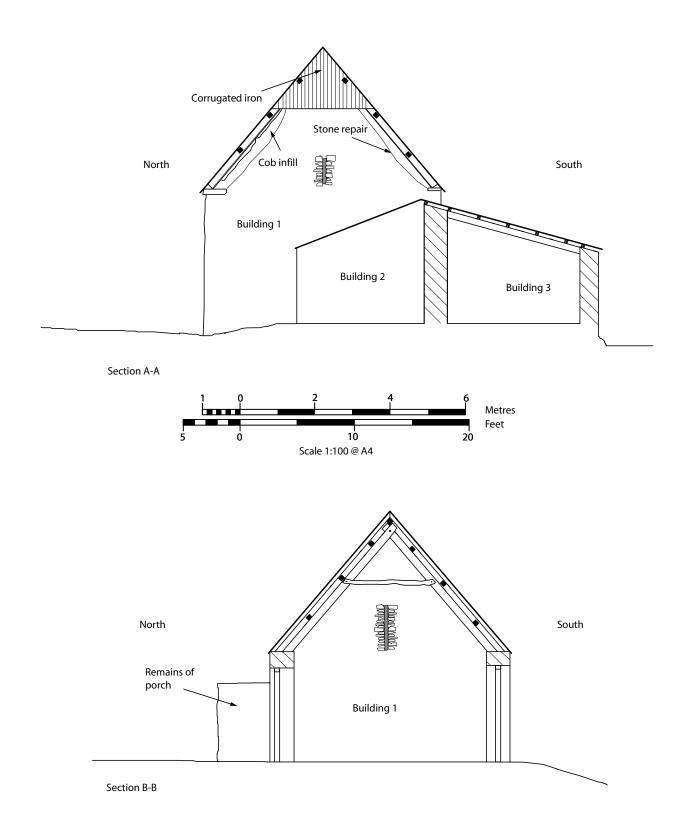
The Threshing Barn and attached buildings (Buildings 1,2 &3), cross-sections.
